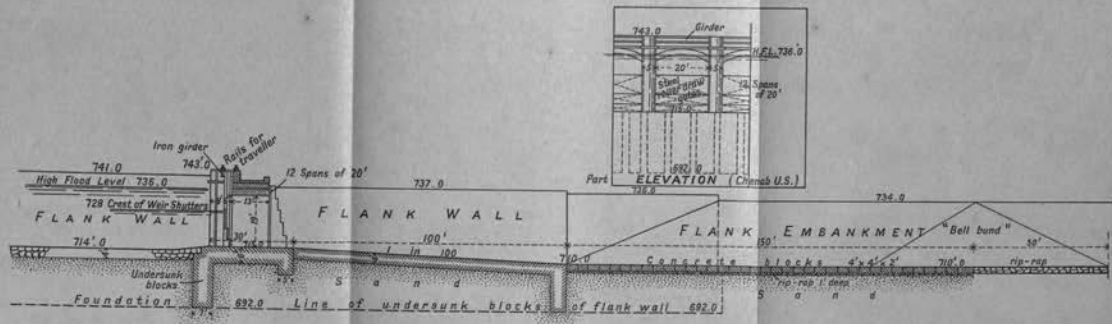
Chenab Canal Weir Sluices at Khanki.
